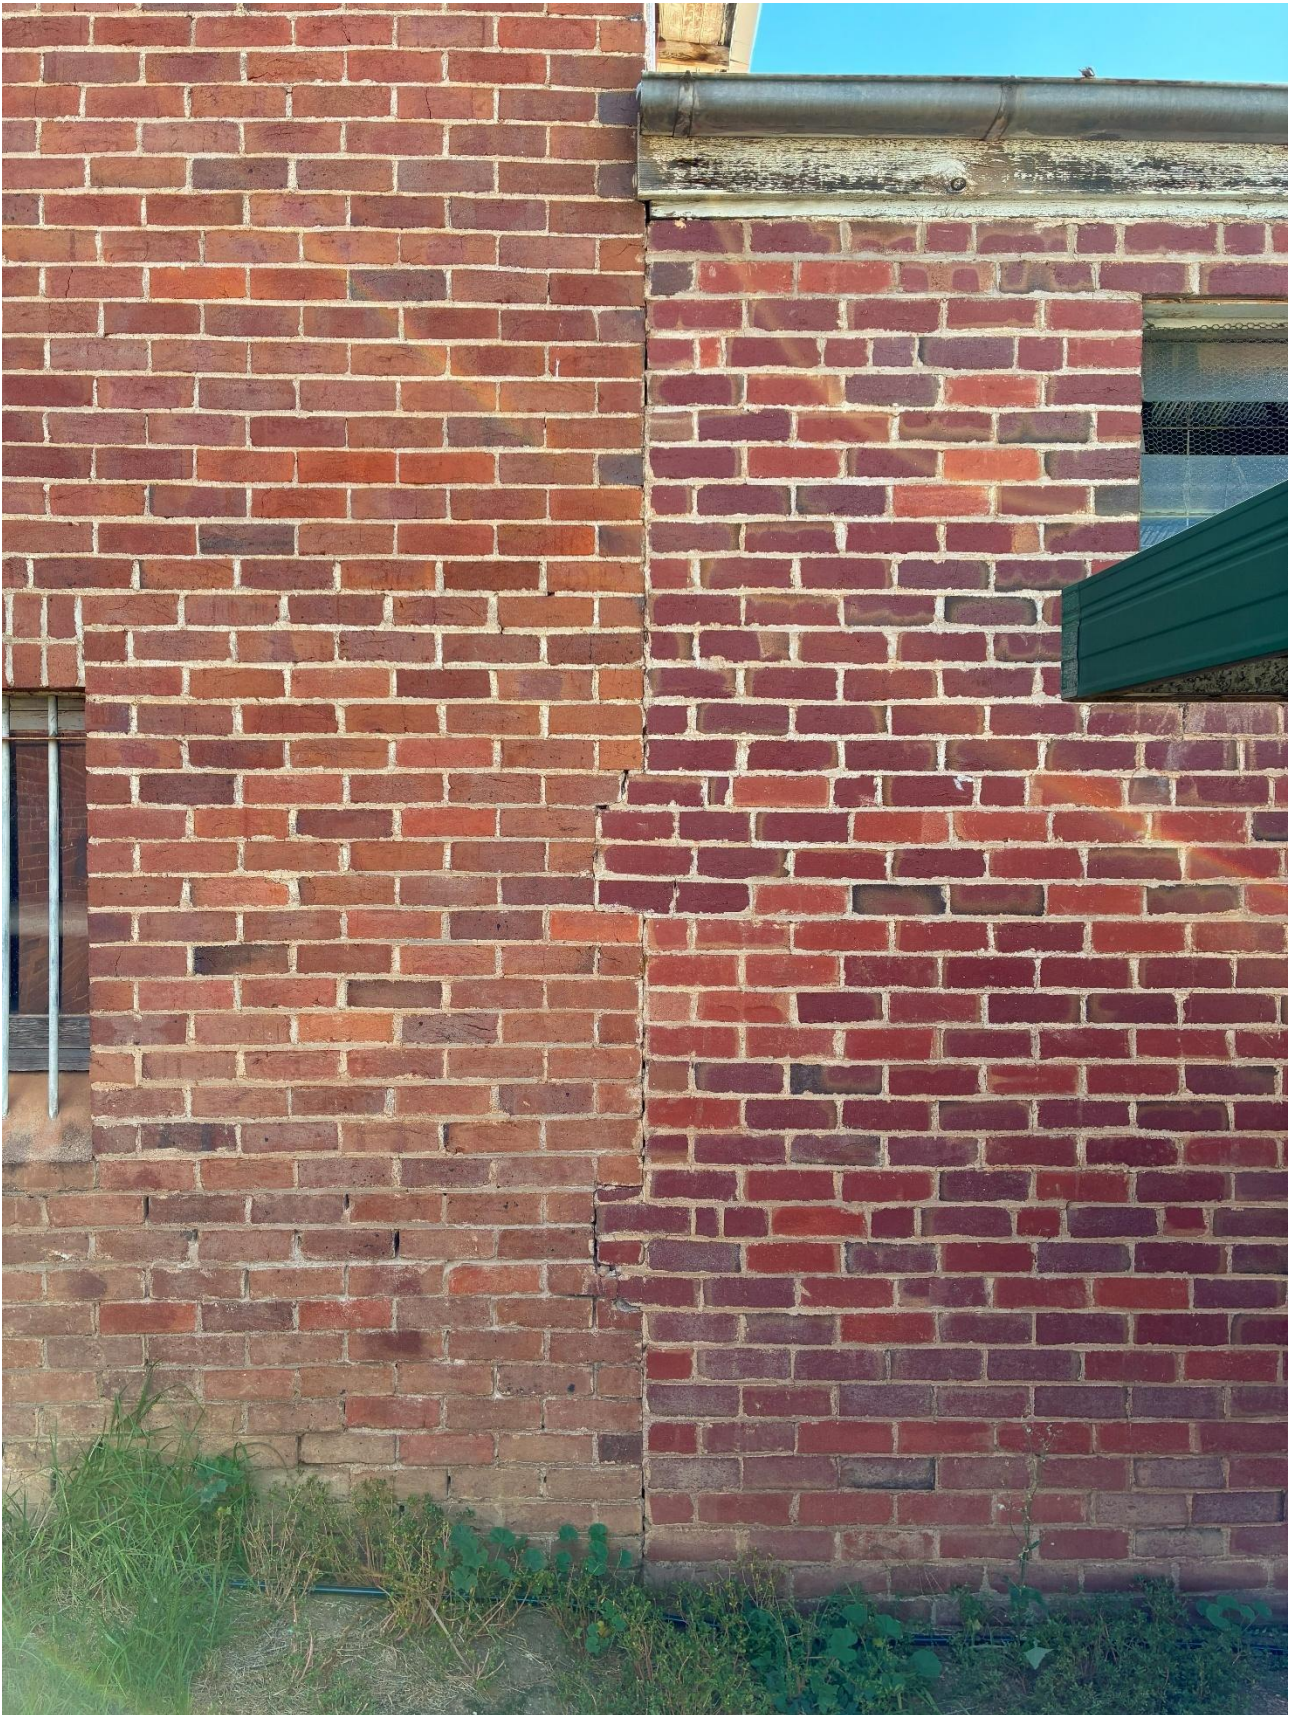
Photo of Building 2 which shows that building was addition to main building.
